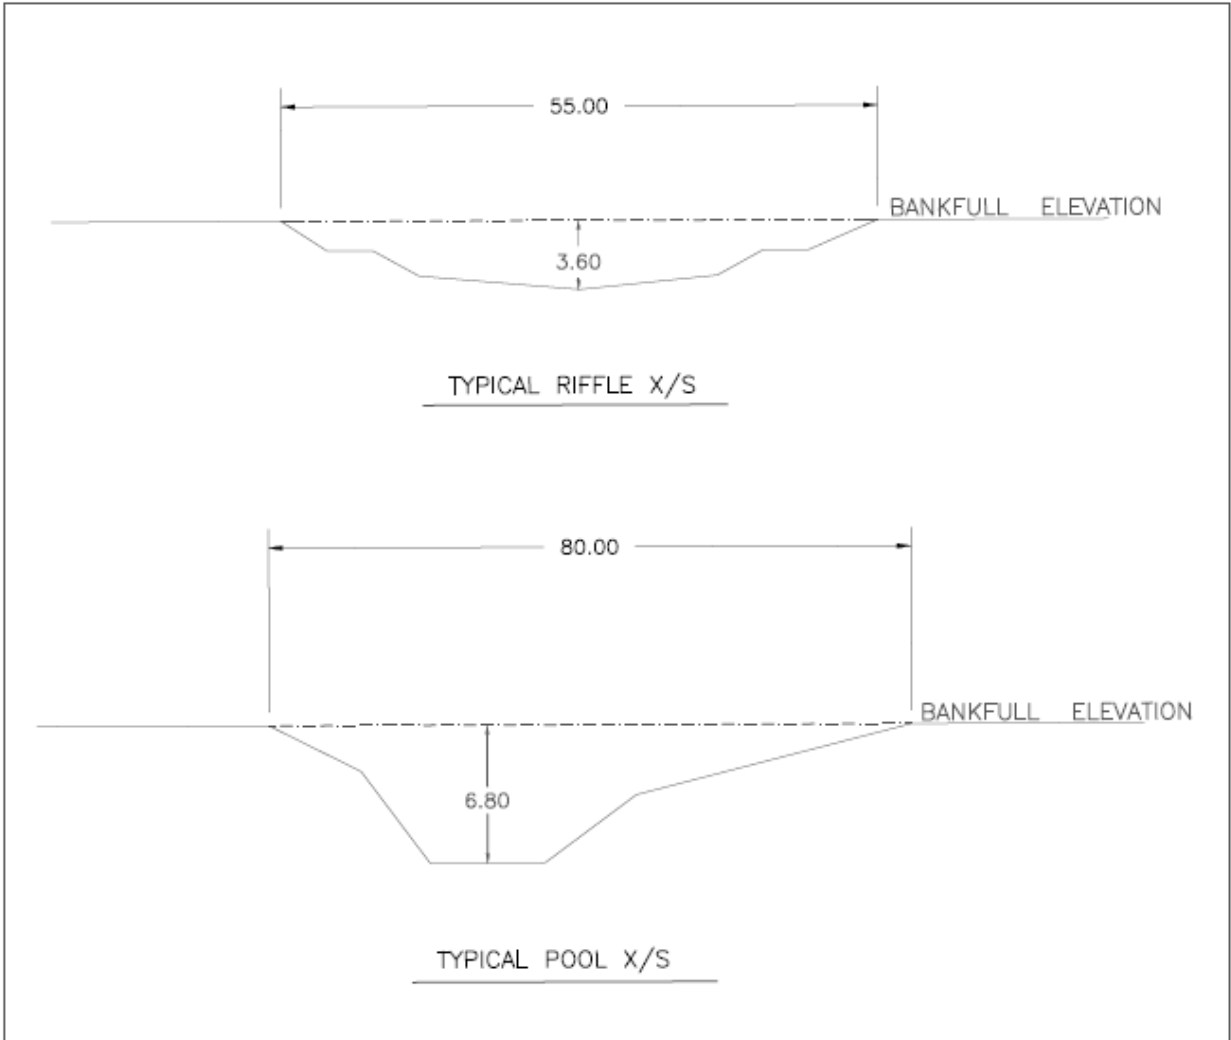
Typical Channel Sections for Post Interim Stable Channel Design
